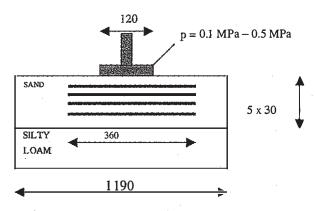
Foundation resting on a sand-cushion resting reinforced with 4 layers of geonet 30 cm apart.
